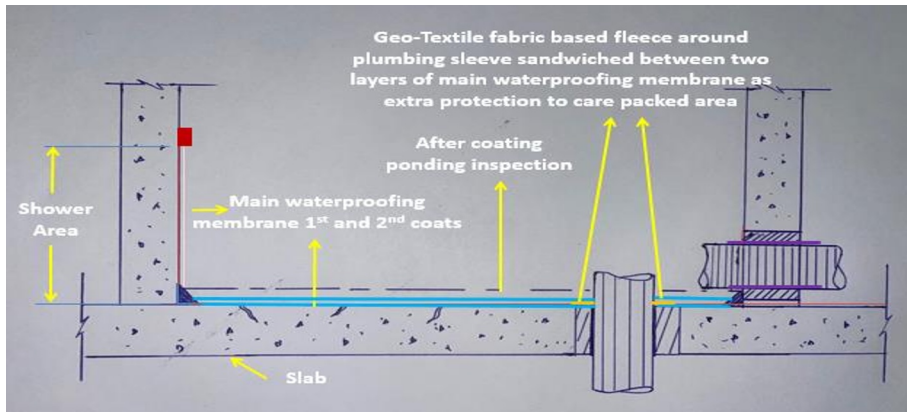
b Sectional Drawing for Typical Toilet Waterproofing
